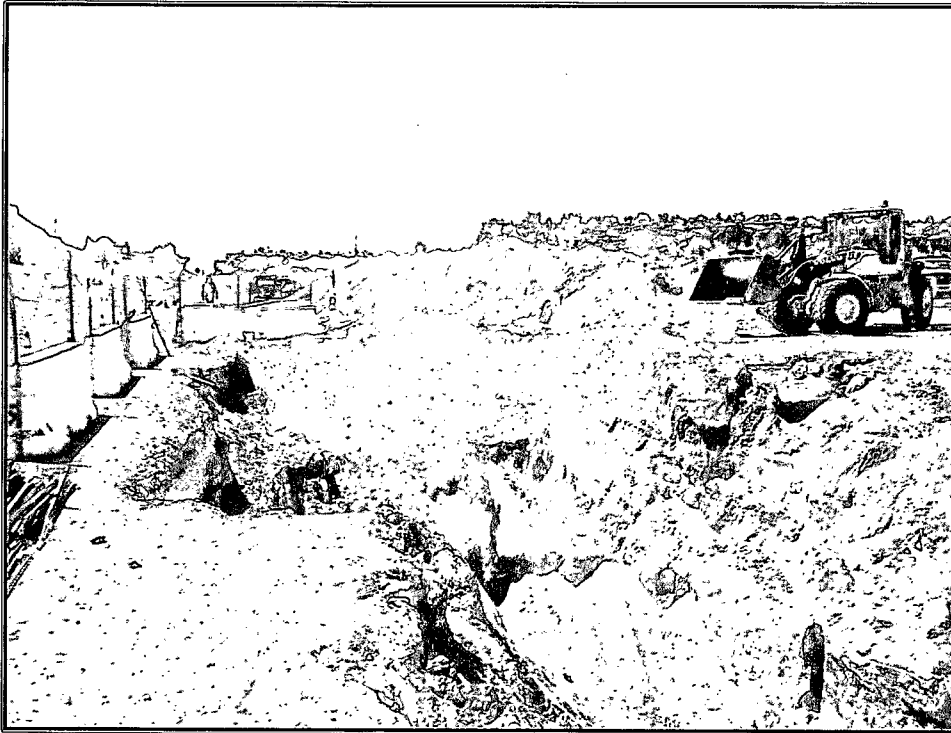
Backfilling of the south portion of the Lateral C-7 Pipeline excavation.
